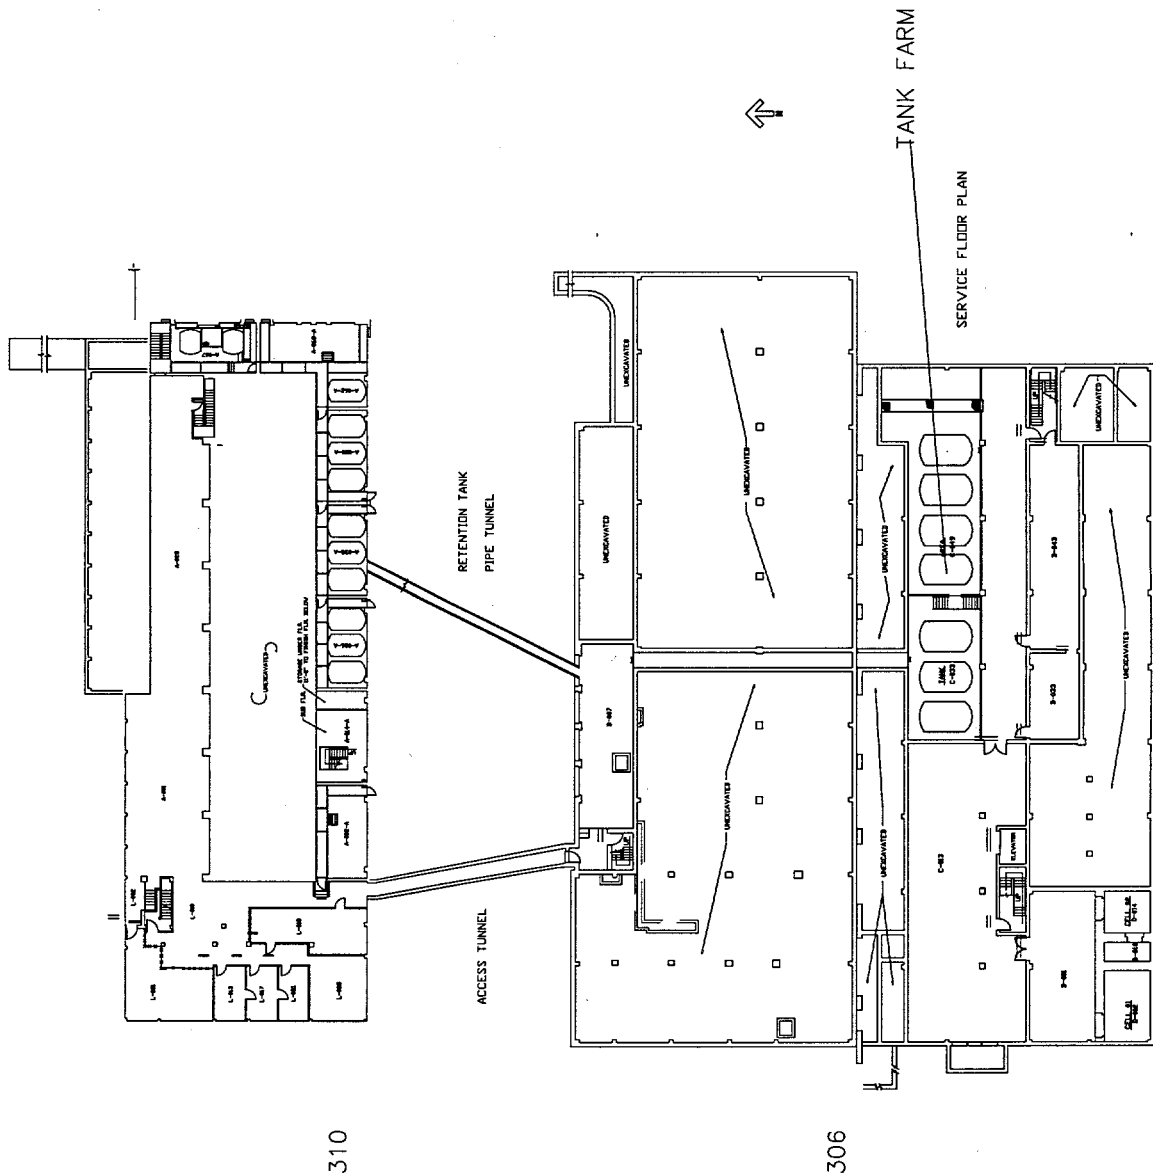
Buildings 310 and 306 with Connecting Tunnels
